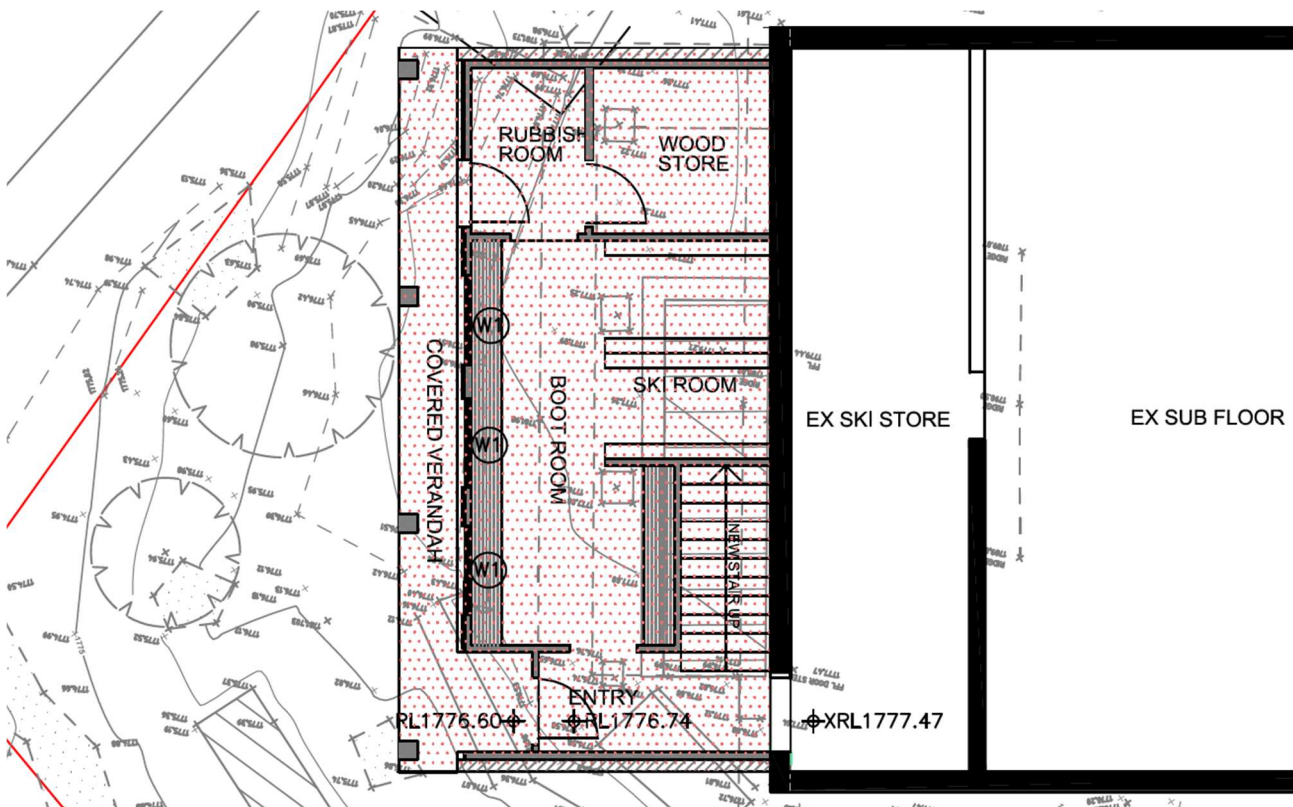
Extract from the Architectural Drawings of the extension (Hatched area).
